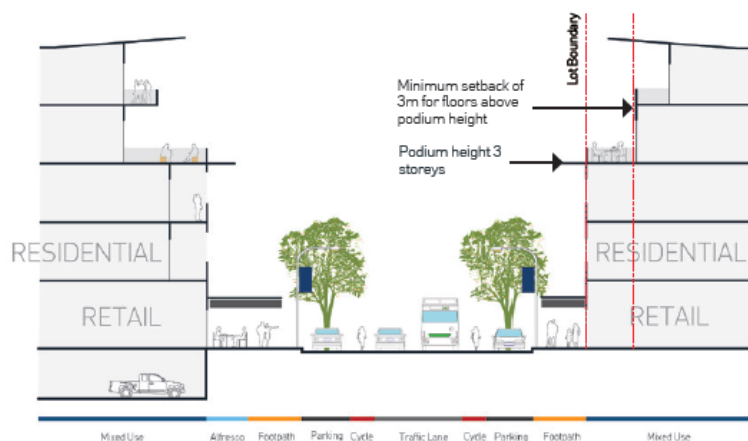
West Facing Street Section - Chisham Avenue Main Street
